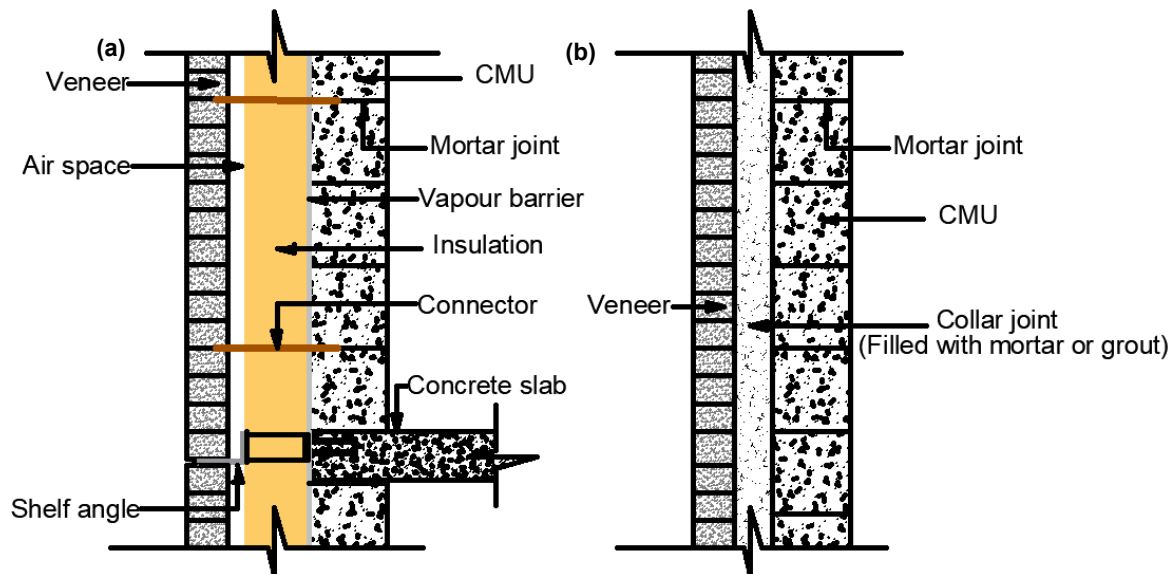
(a) Vertical section of a double-wythe cavity masonry wall with connectors (b) vertical wall section with grouted collar joint
